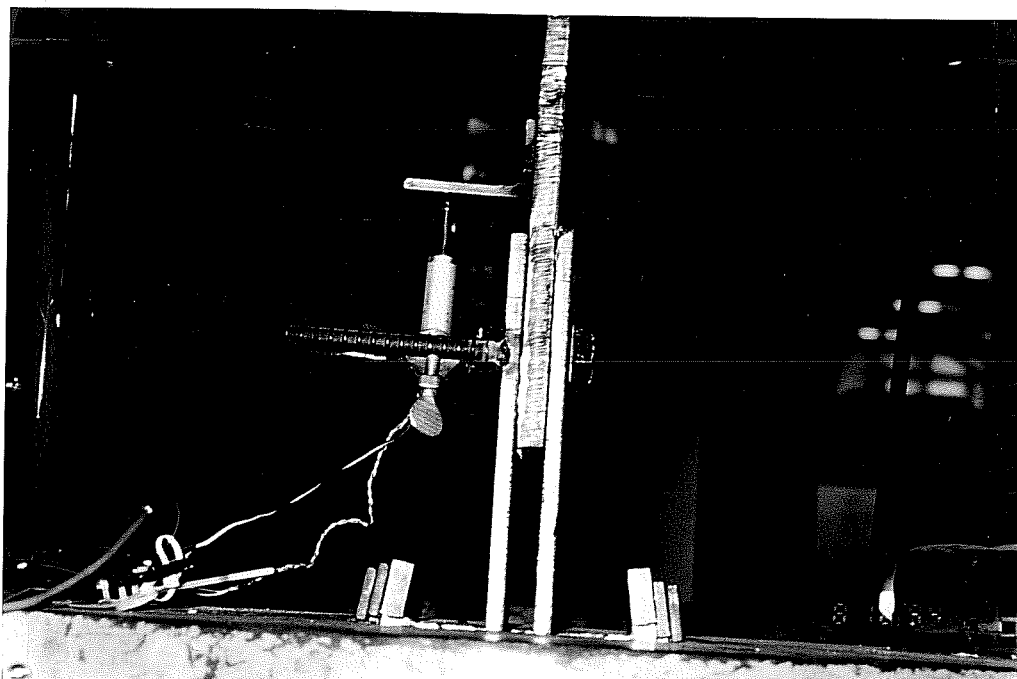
Typical test bolt before failure, tested in a tension splice
